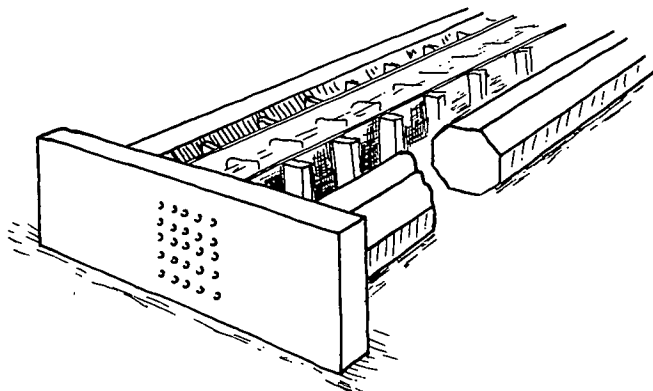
Temporary stressing arrangement using a pair of concrete piles as compression struts.
